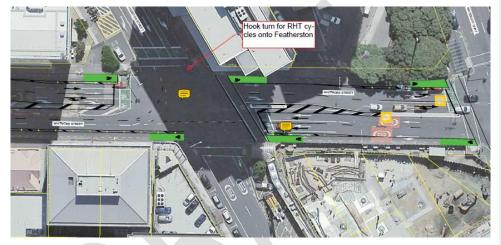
Excerpt from plan - Whitmore Street / Featherston Street intersection (C19)
